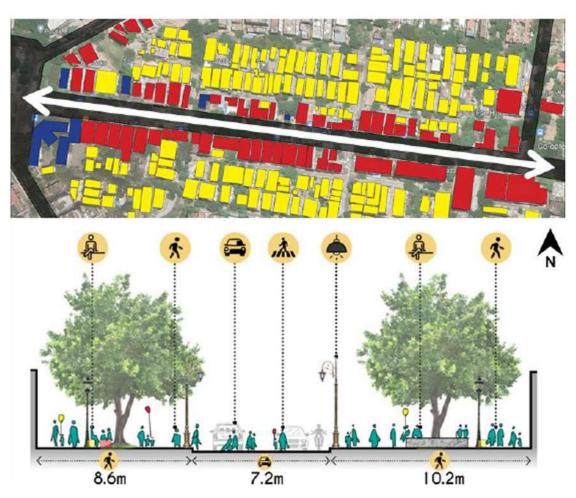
Street extent & Schematic section of the Street. Source: Author 2022
